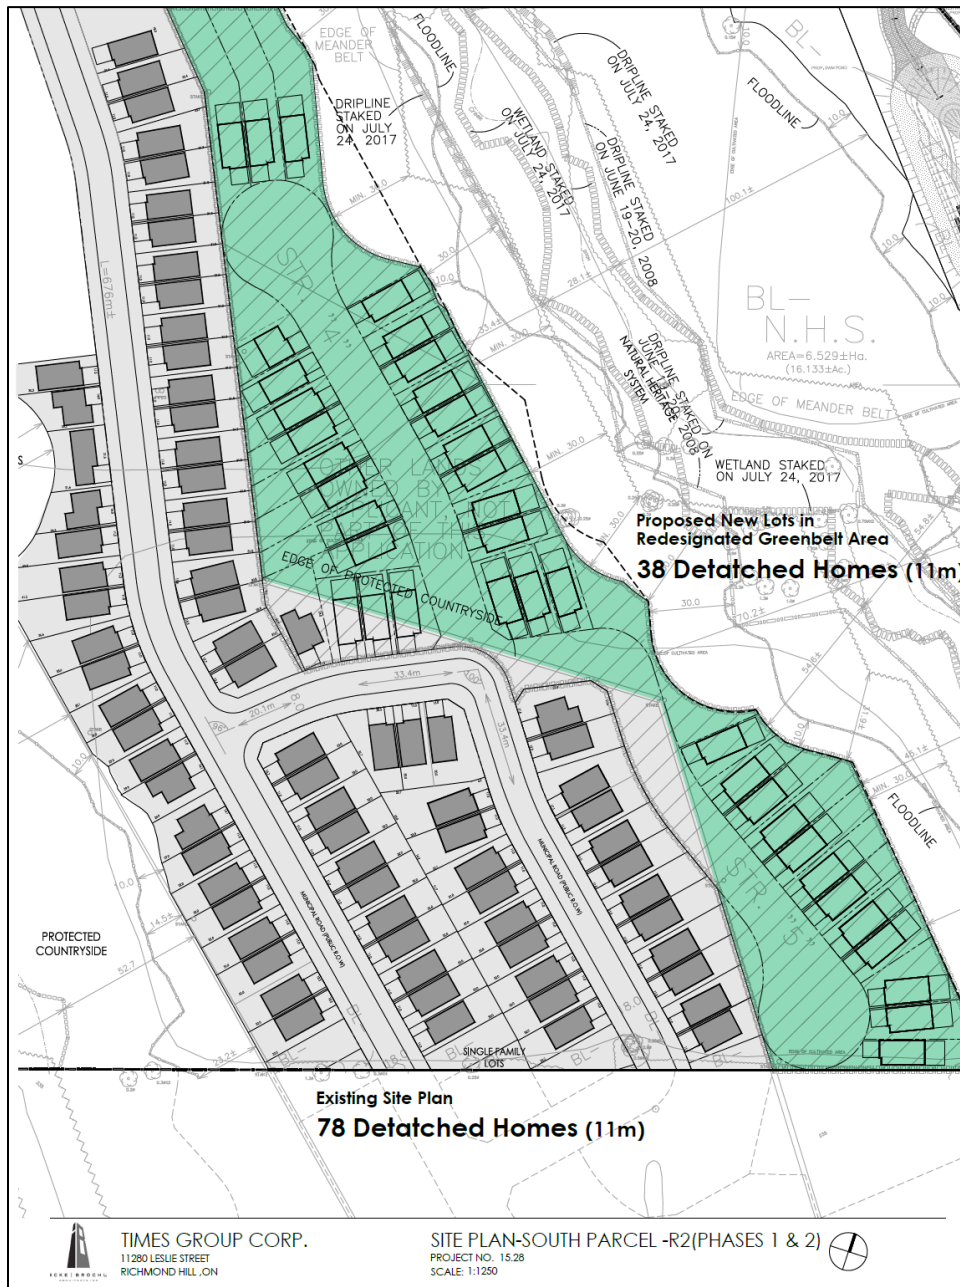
Icke Brochu Site Plan depicting the layout of 38 Net New Detached Single-Family Homes in previously designated Greenbelt Areas at 11280 Leslie
